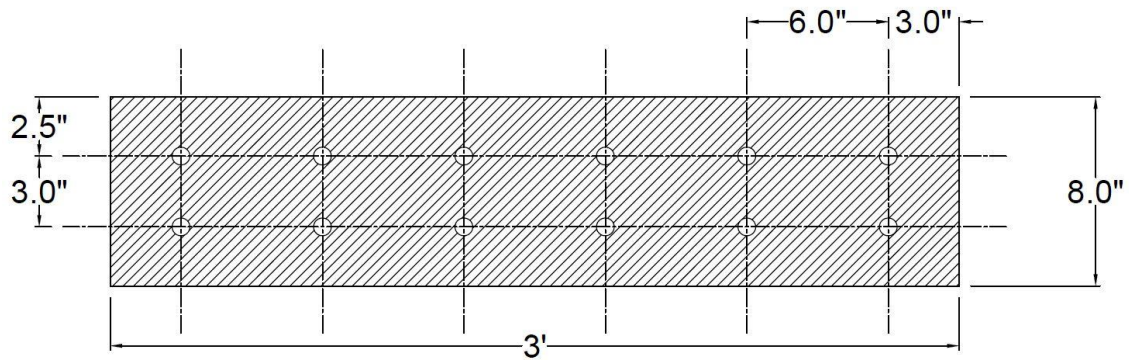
9: Plan view of a sample showing test locations of Schmidt hammer.
